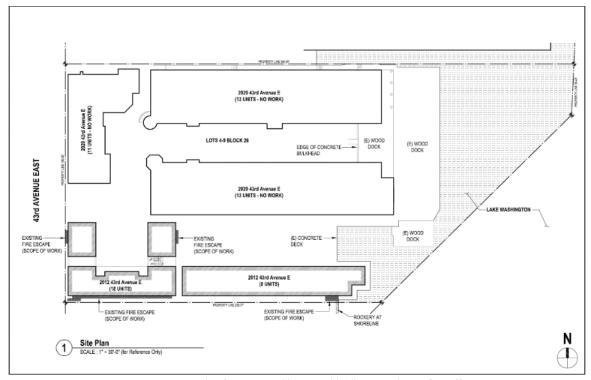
Site Plan (as prepared by H. Todd Kilburn, Architect (2018))
